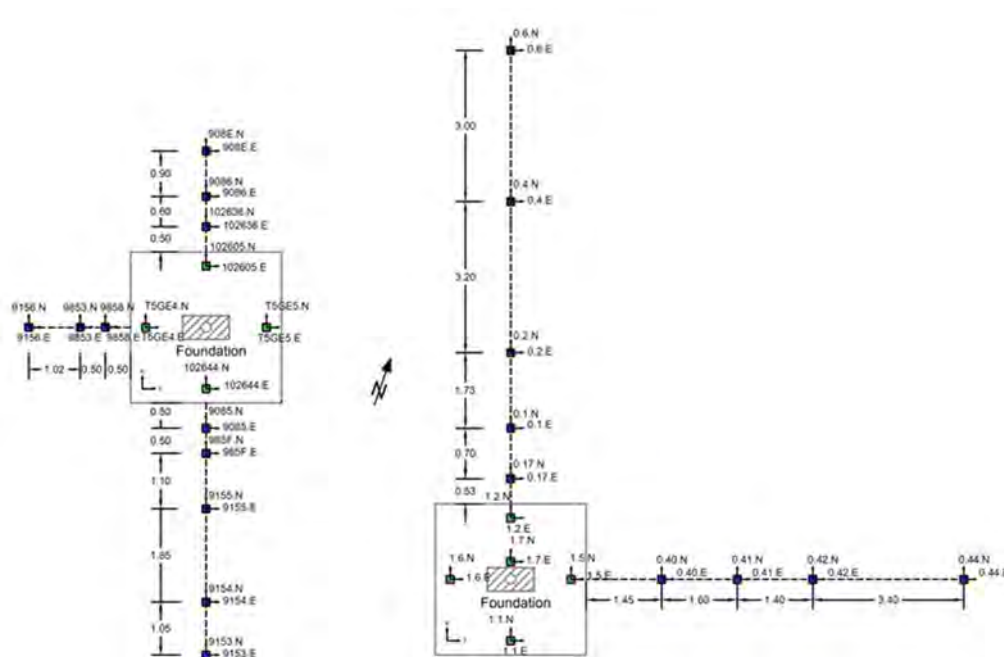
Plan view of the instrumentation layout of the foundation and the soil surface during the experiments performed on the natural soil (right) and after replacing it with GRM (left)
